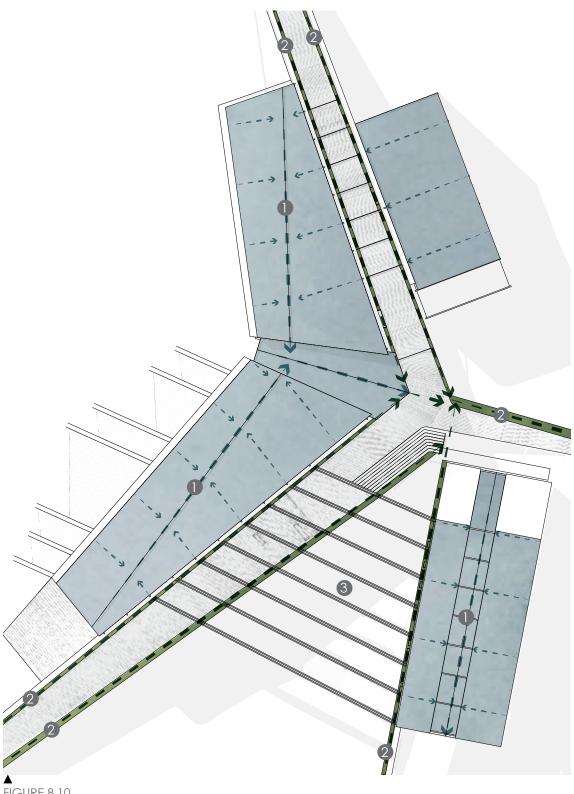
VIVARIUM ROOF & DRAINAGE PLAN (Author, 2016)
